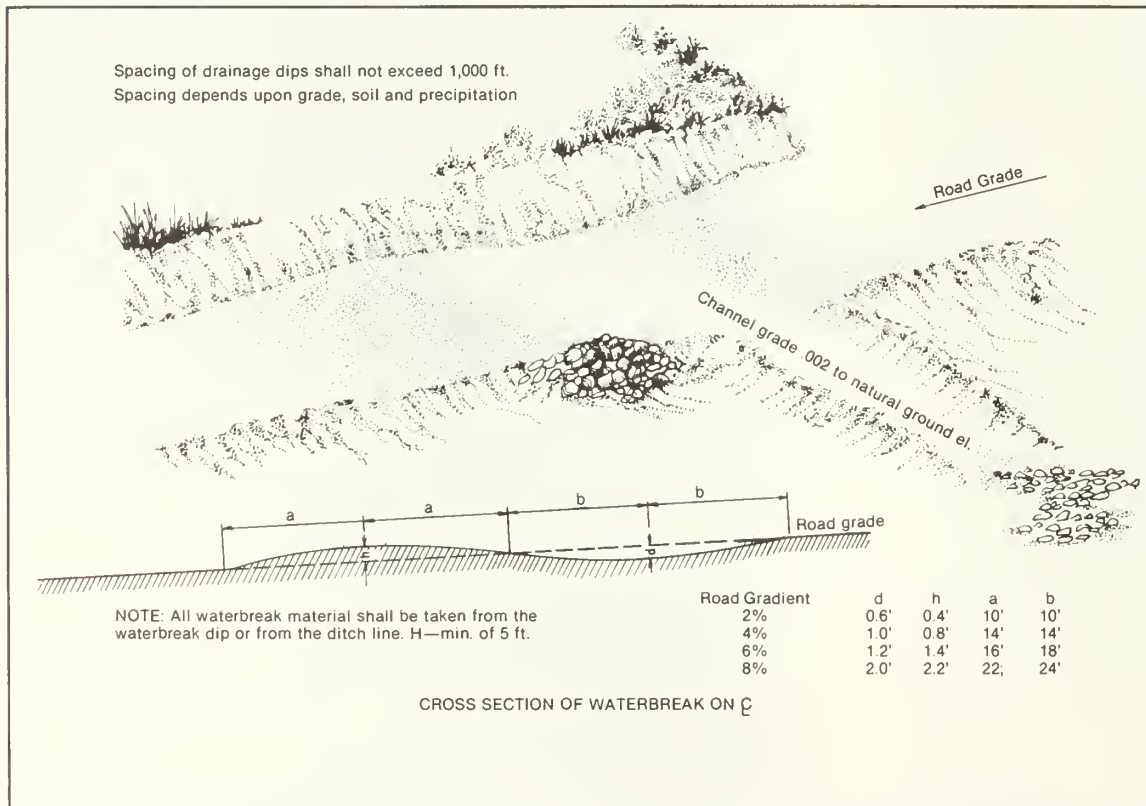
"Thank-u-Mam" for Slight to Moderate Slope for Access Roads
